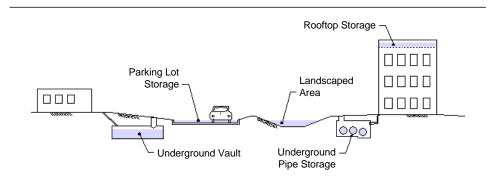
Examples of Typical Stormwater Storage Facilities
